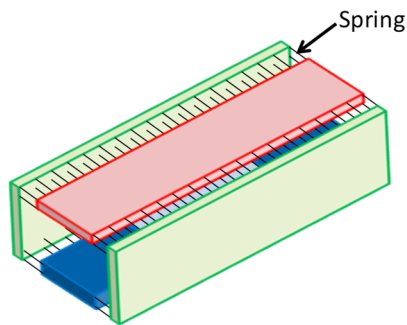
Connecting conditions of the side panels and the roof or floor in the longitudinal direction
